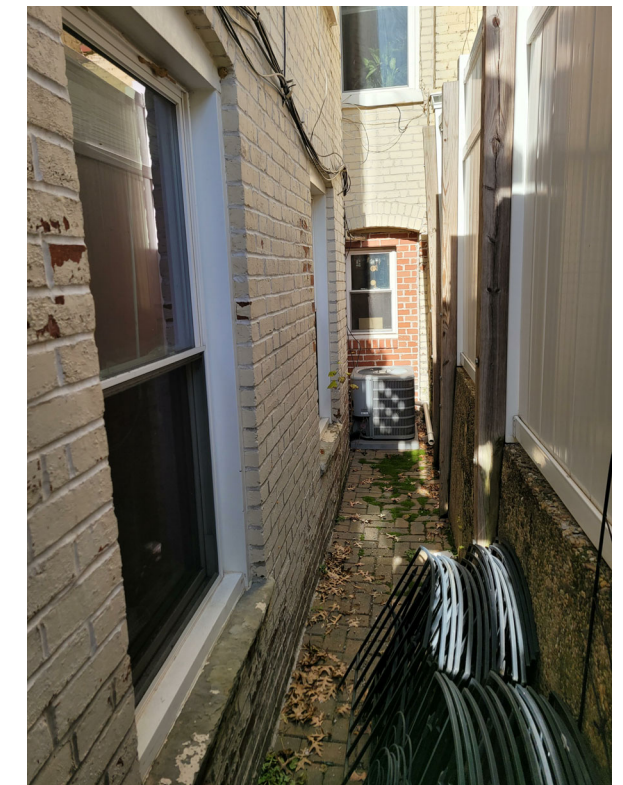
Image F: Side yard corridor. Adjacent building fence to the right of the photo
